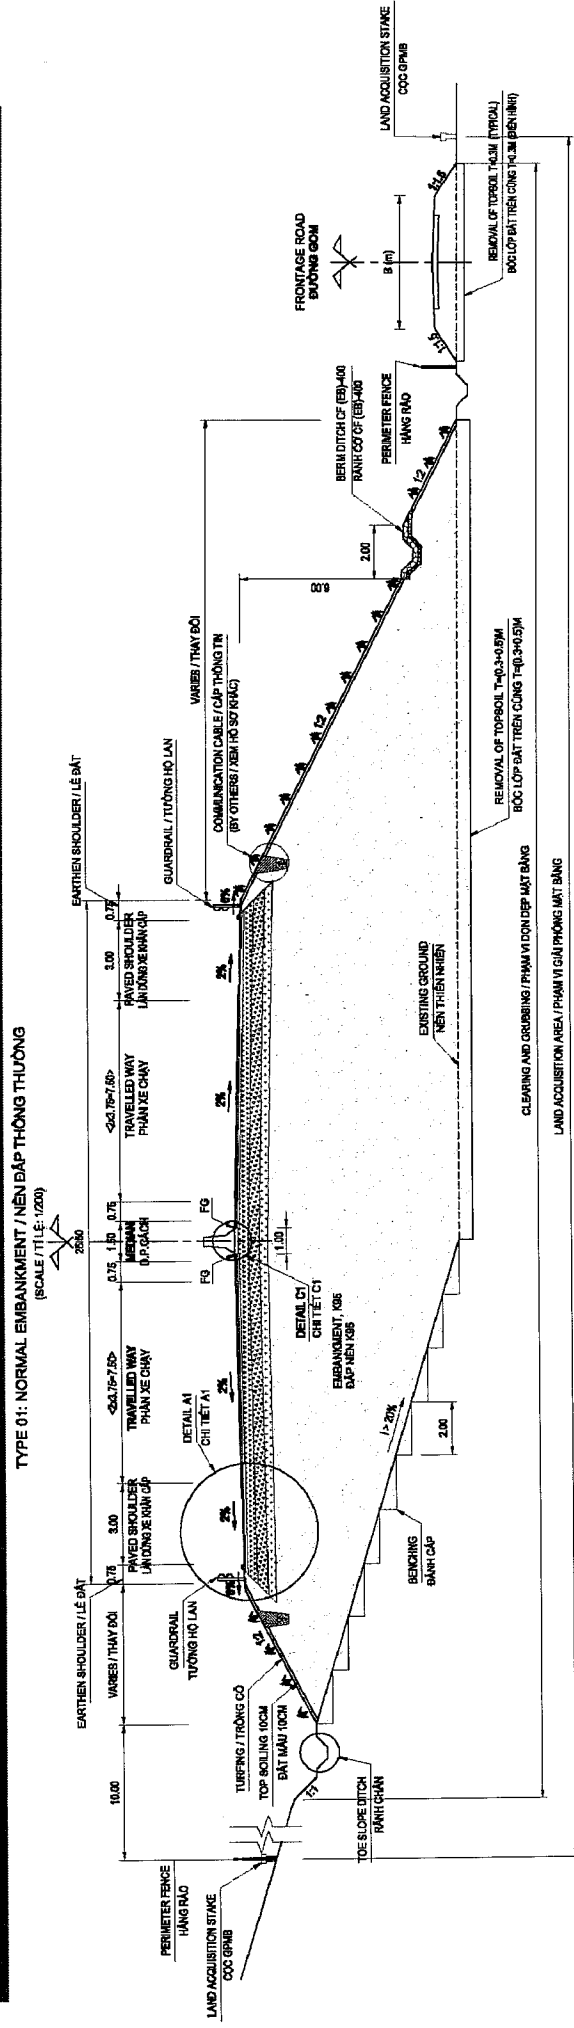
Typical Cross Section of Expressway on Normal Embankment
